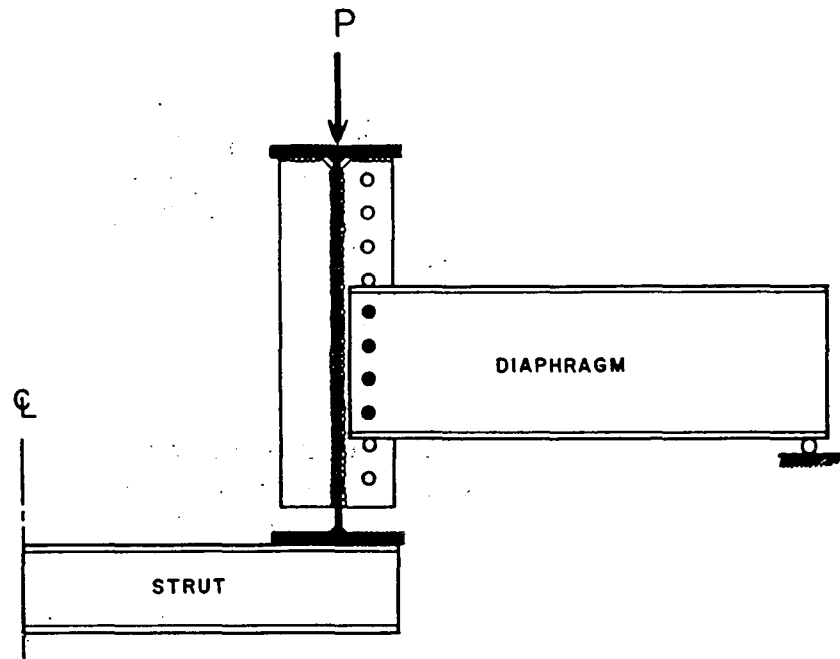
Test Setup for Distortion-Induced Web Gap Fatigue Cracking (from Keating and Fisher 1987)
